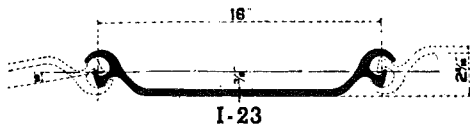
SECTION OF STEEL SHEET PILE SHOWN IN FIG. 85.
